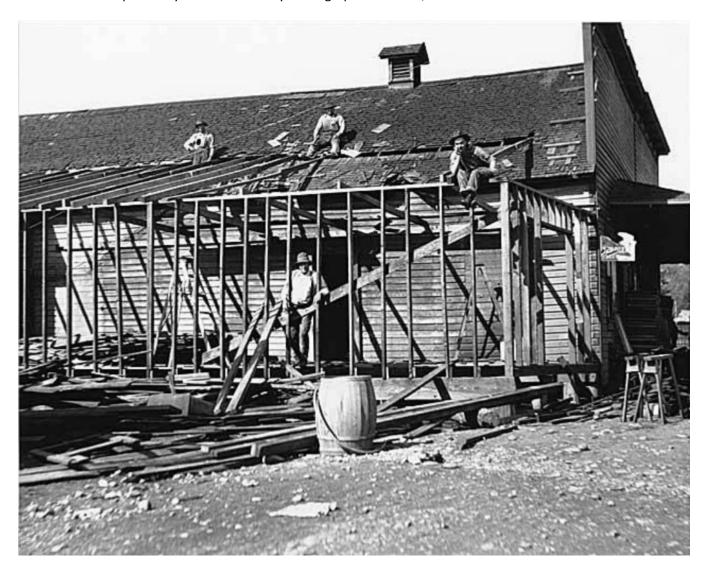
View from building adjacent to Mezzavilla's general store, camera facing southeast toward the highway, ca. 1949. Source: Maple Valley Historical Society Photograph Collection, P17.02.16.
